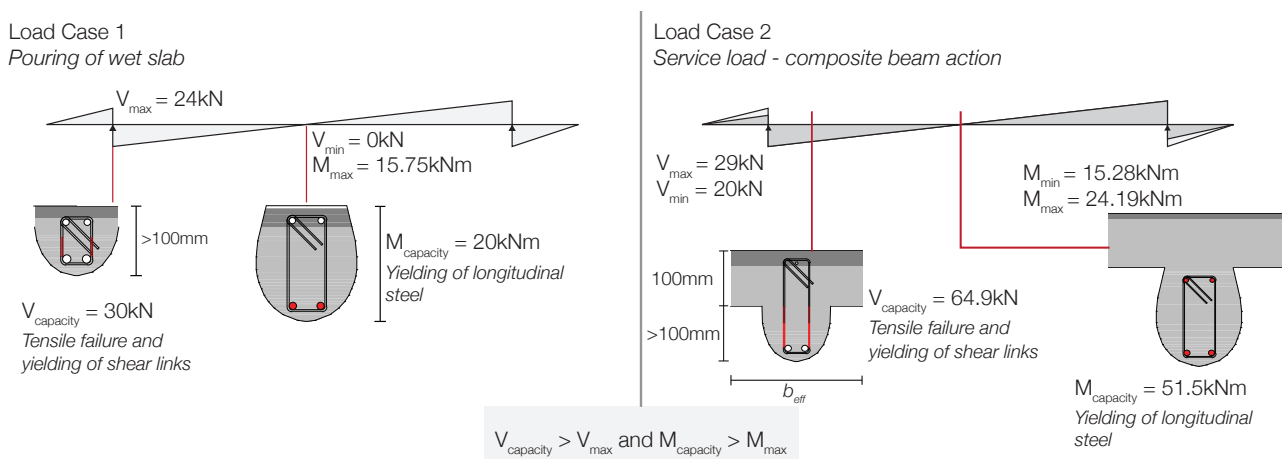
Transverse reinforcement. Load case 1 (l) and Load case 2 (r).
